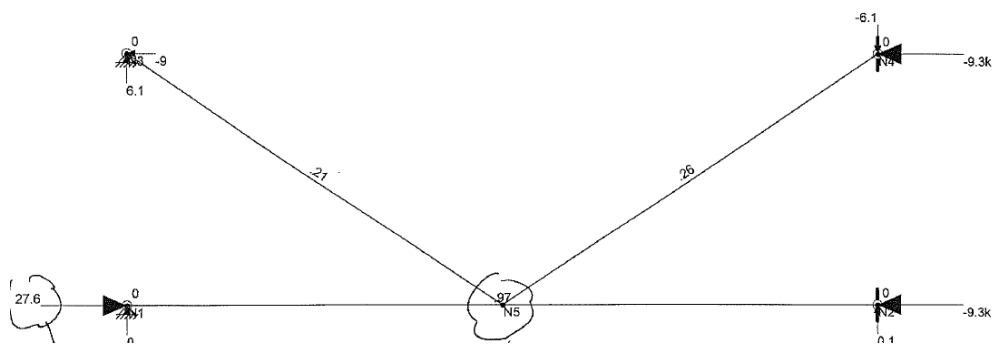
Engineering Drawing. Example wind loading of k-frame Diaphragm
